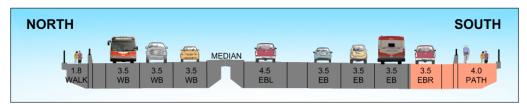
Nose Creek Proposed Stage 1 Bridge Cross Section
